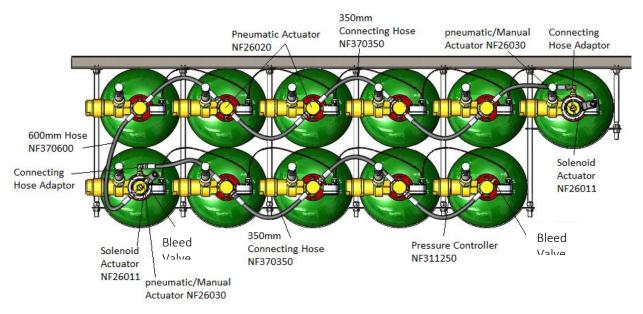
Actuation hose layout (selector valve system) – Plan View
